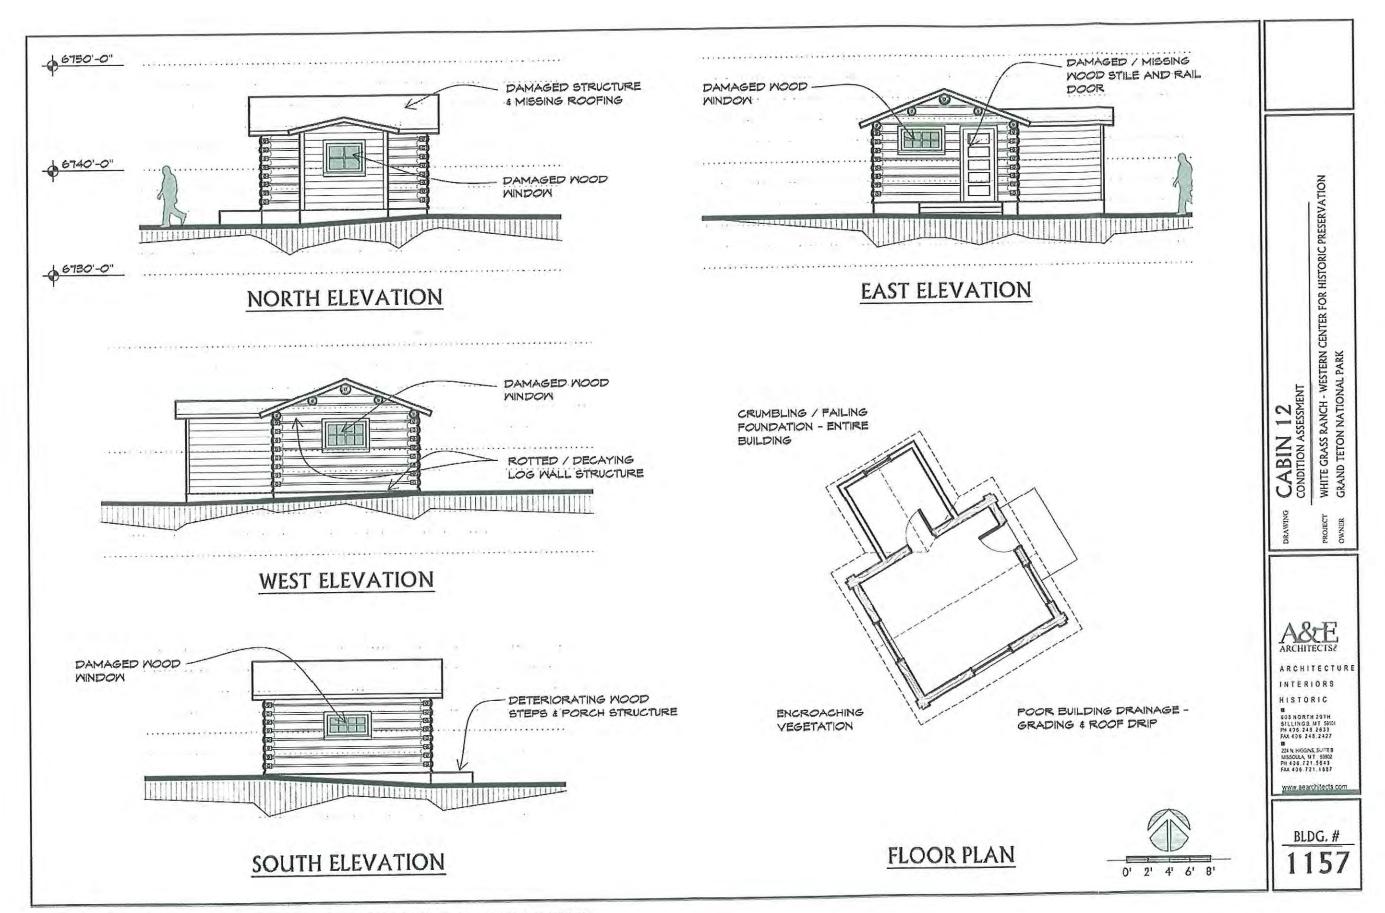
Existing conditions plan and elevations of HS-1157, Cabin 12 (A&E: 2006).
